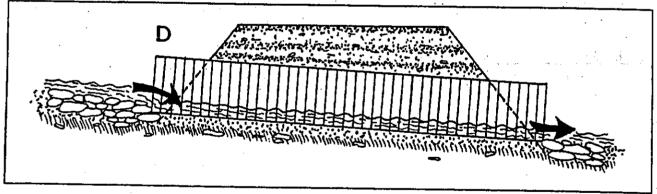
Placed correctly (D), the culvert is set slightly below the original stream grade and protected with armor at the inlet and outlet.
